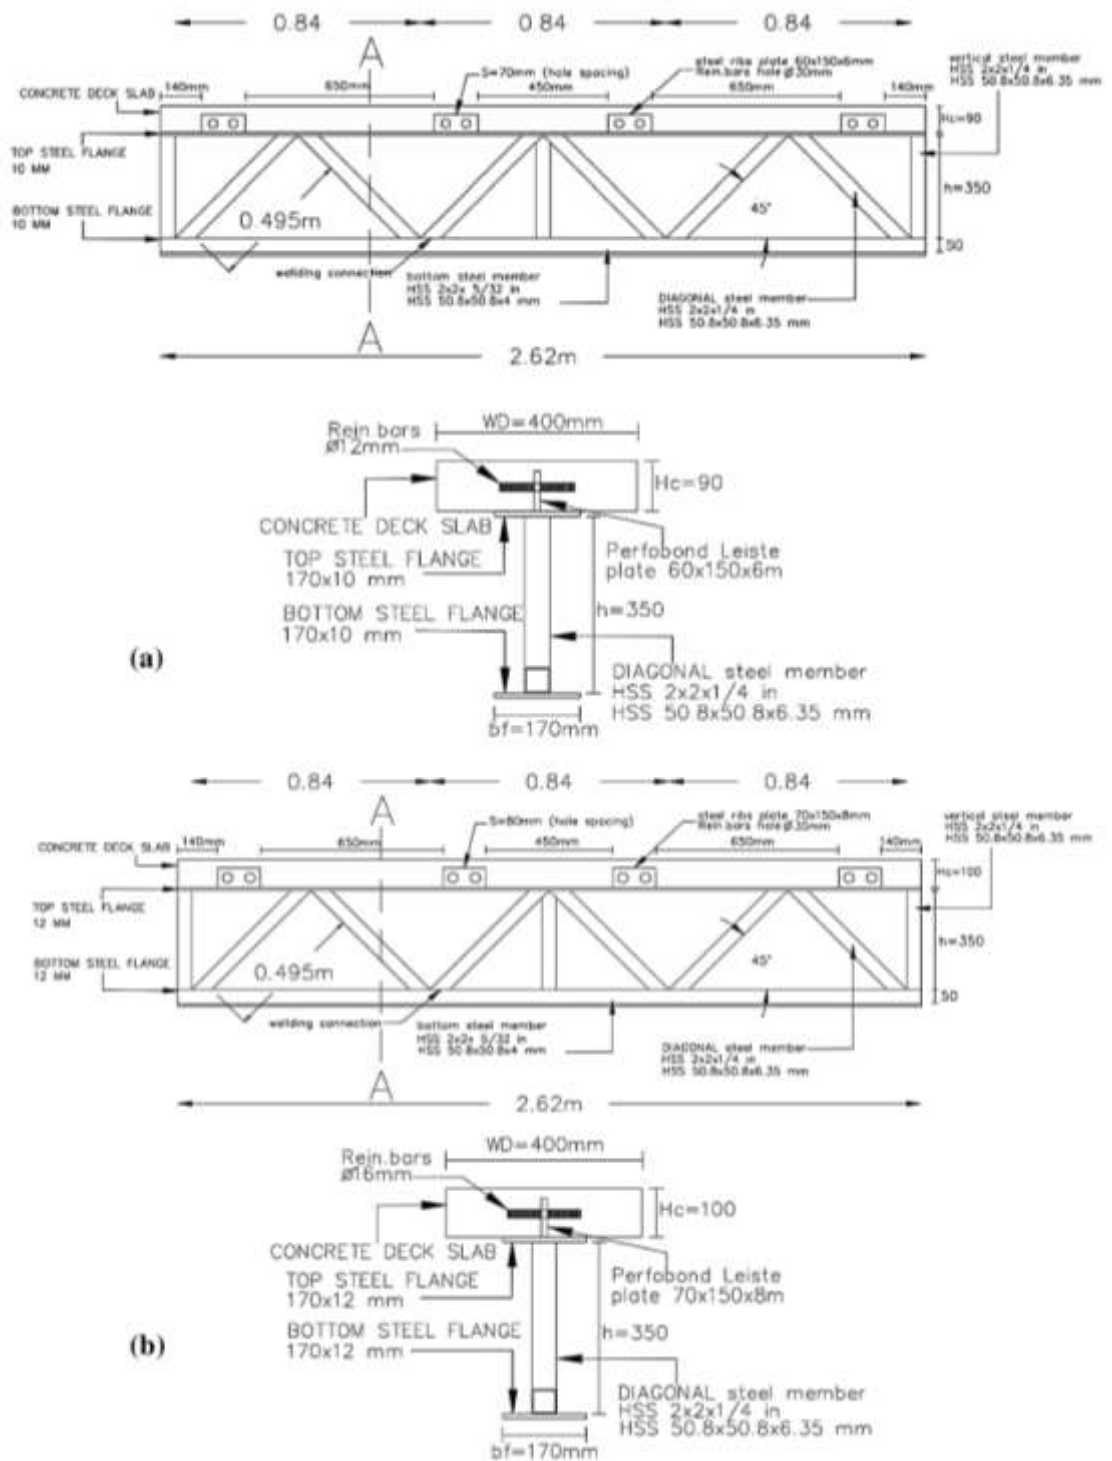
First Category Composite Truss Girder (SCTG) Models. (a) Layout of Specimen Two (SCTG-3), (b) Layout of Specimen Three (SCTG-4)
